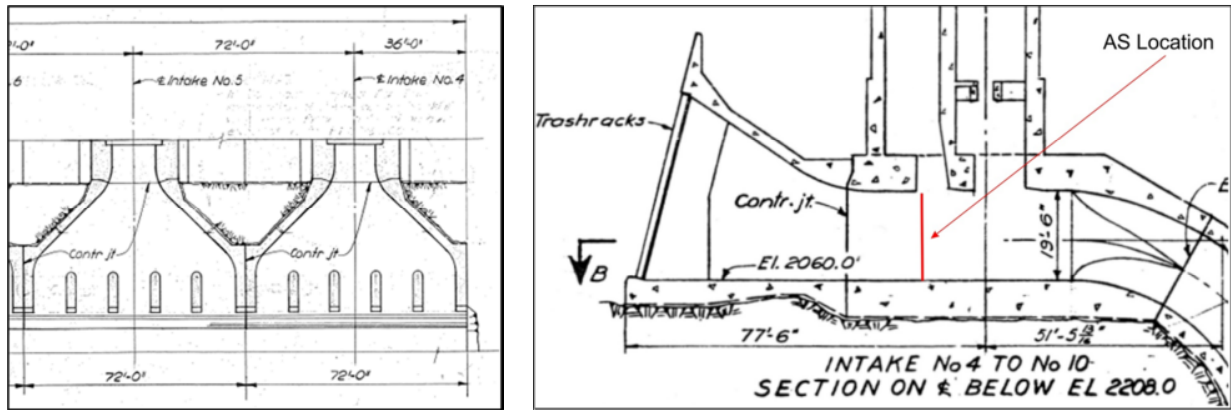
Plan (left) and vertical (right) section views of the Unit 4 intake.
